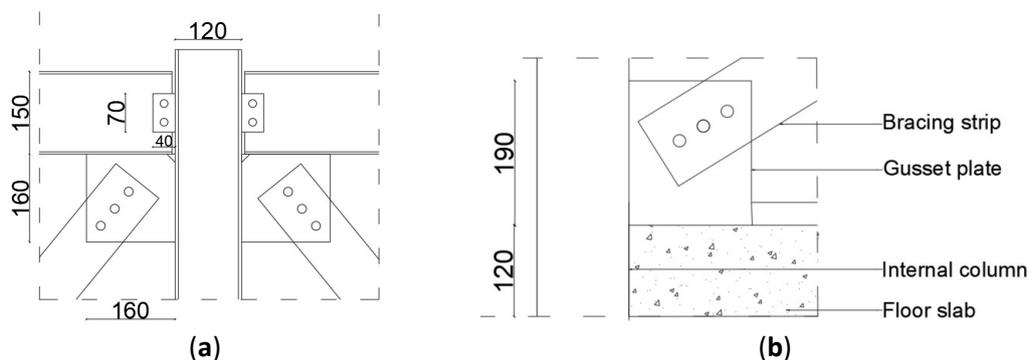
Bracing to gusset plate connection: (a) Upper connection, (b) Lower connection (own work).
